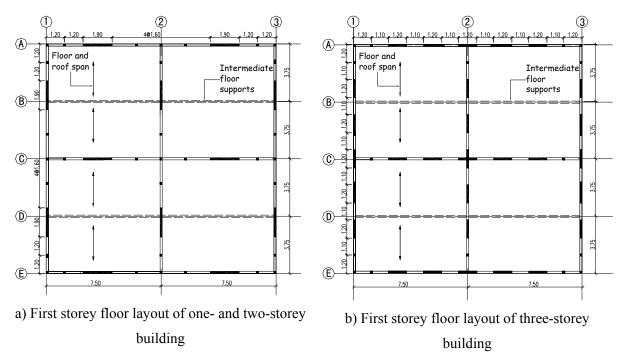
Plan views of the first storey of 15 m × 15 m buildings in accordance with the bracing requirements in Canadian codes
